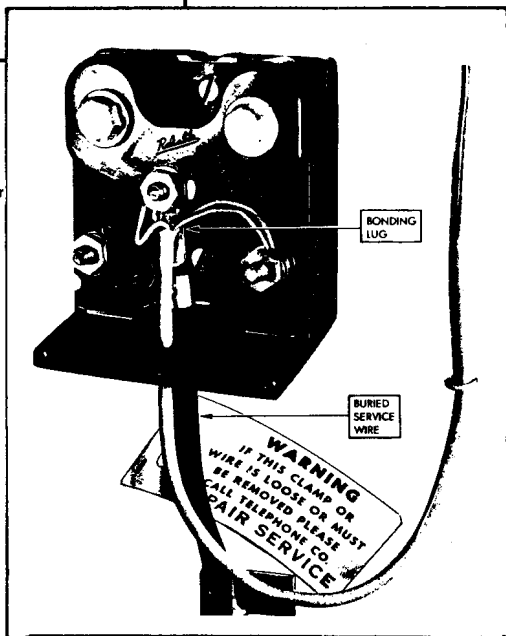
123 Type Protector Mounted on Wall (For Indoor Use Only)
